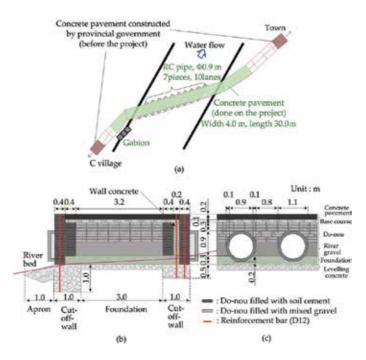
Plain and cross-sectional view of the vented ford: (a) Plain view; (b) longitudinal section view; (c) vertical cross-sectional view.
